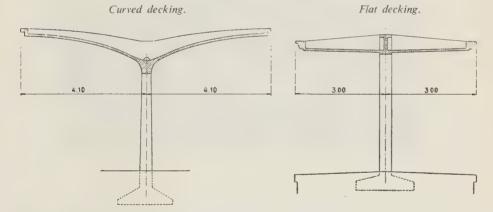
S. N. C. F.: Reinforced concrete shelters.
